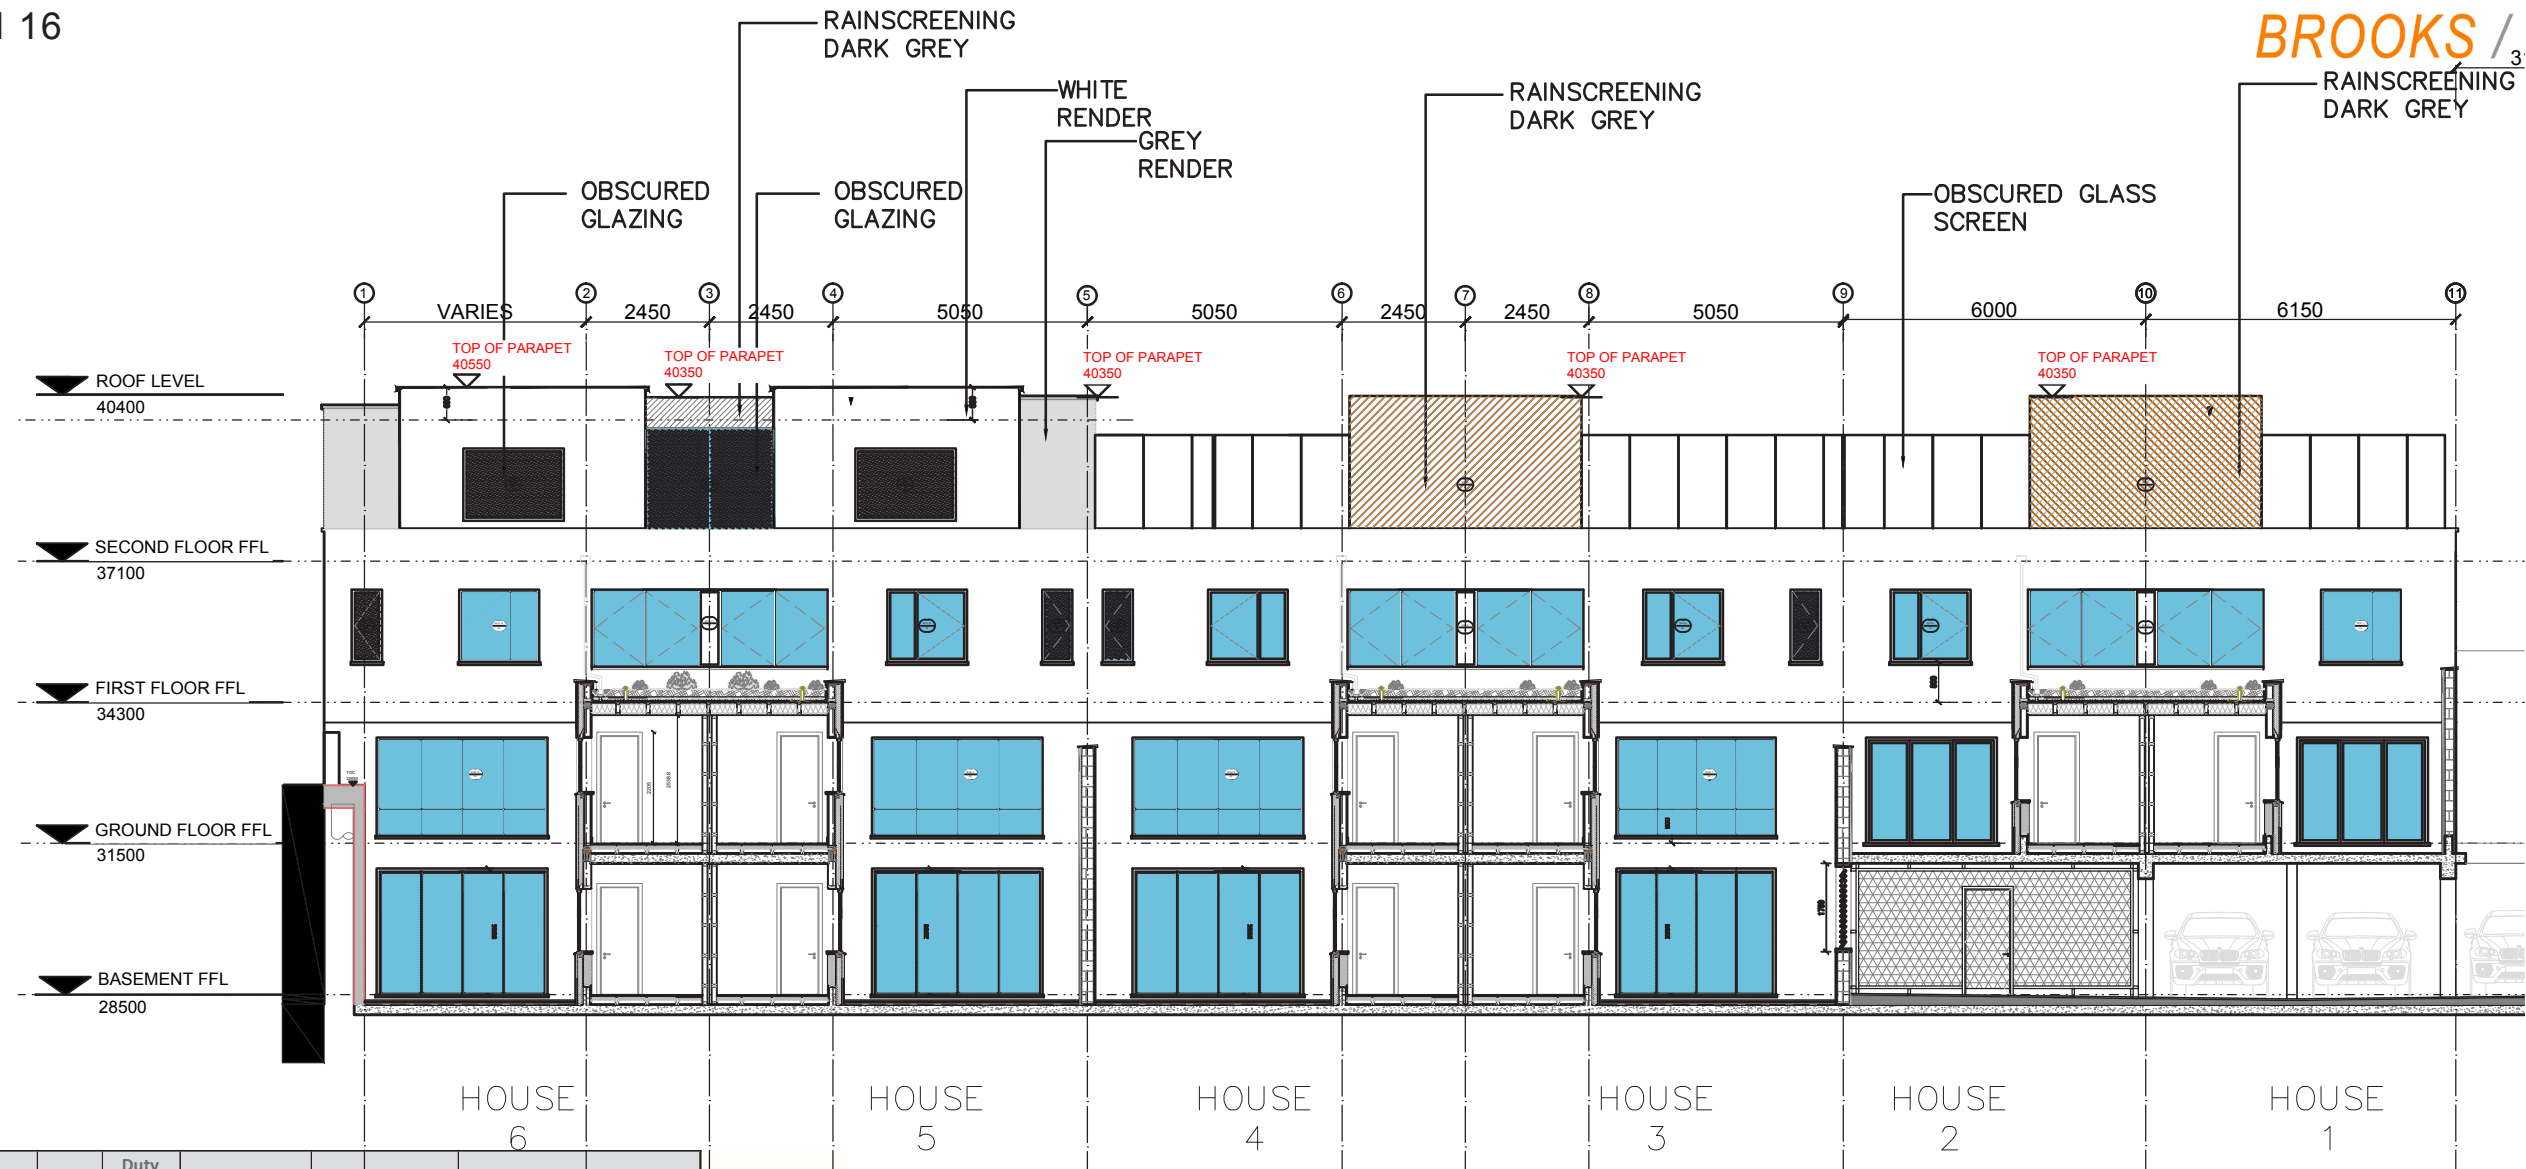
South elevation 1:150 showing new rainwater pipes' runs; one per two houses
